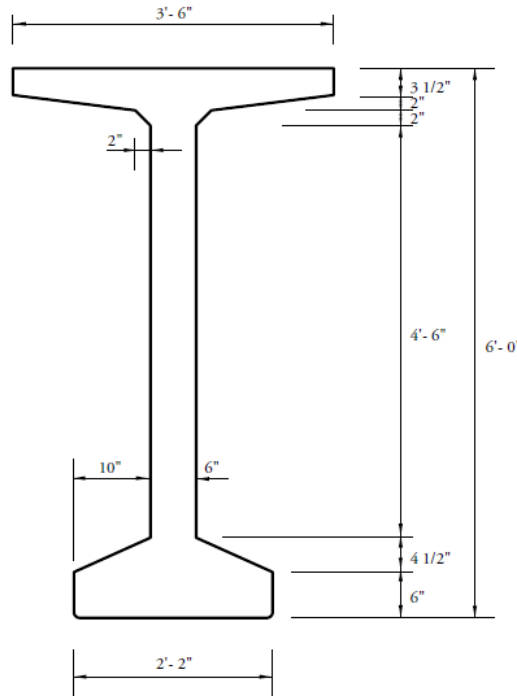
AASHTO-PCI BT-72 girder cross-section [8]
